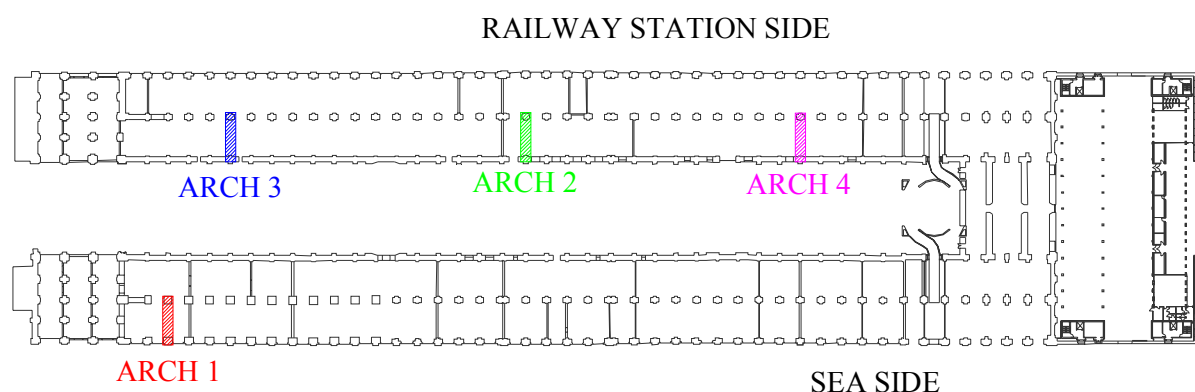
Plant of the ground floor of the storehouses with tested arches individualizes
